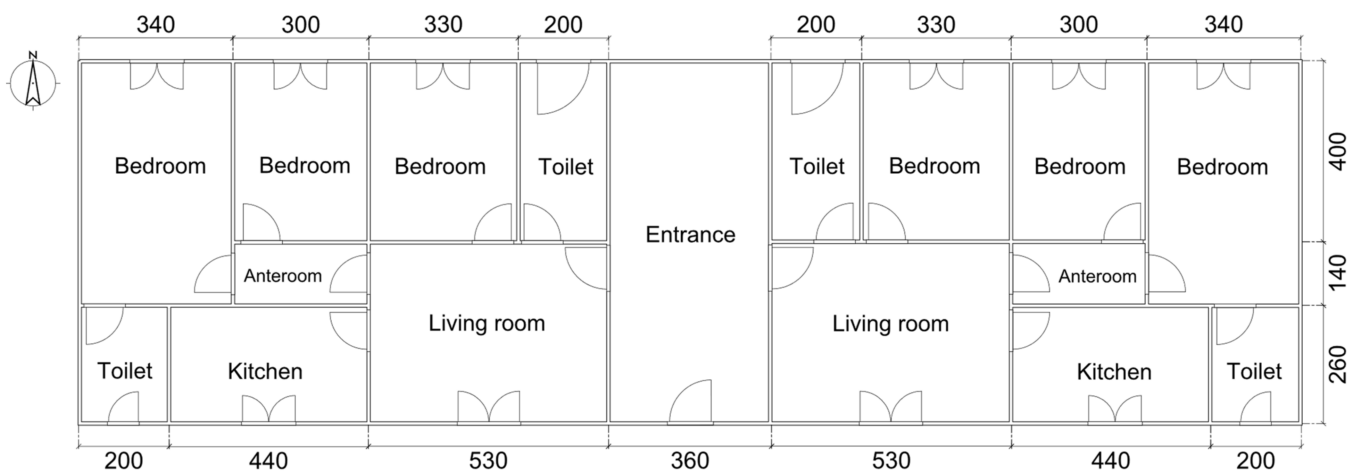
Plan views of one storey of the benchmark apartment block (dimensions in cm).
